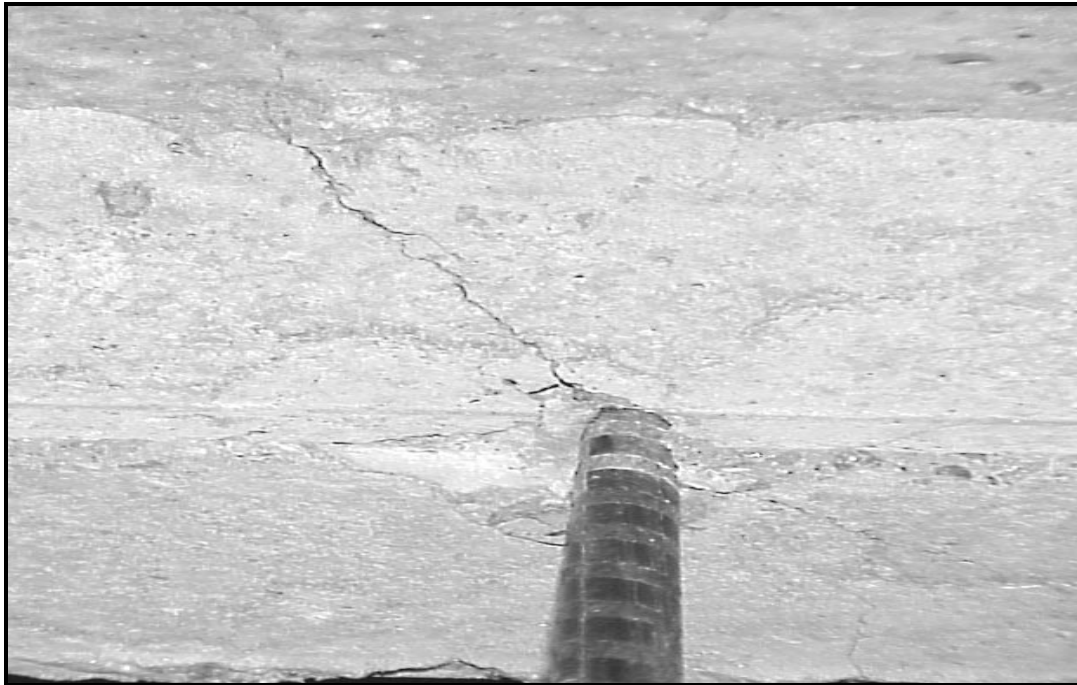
Initial cracking surrounding the prestressed CFRP tendons
